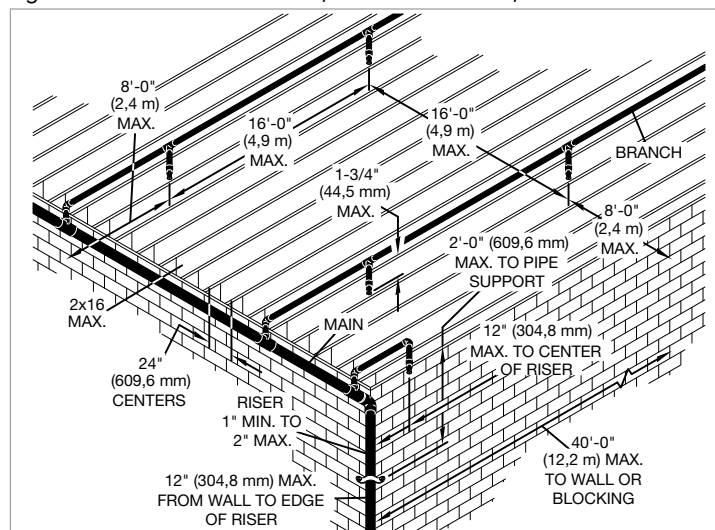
Unfinished Basement, Solid Wood Joists, Blocking
